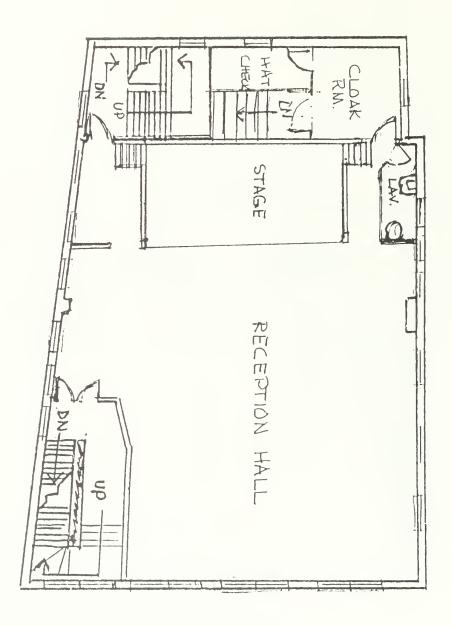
Polish Club building: conjectural second-floor plan, 1909-70.
